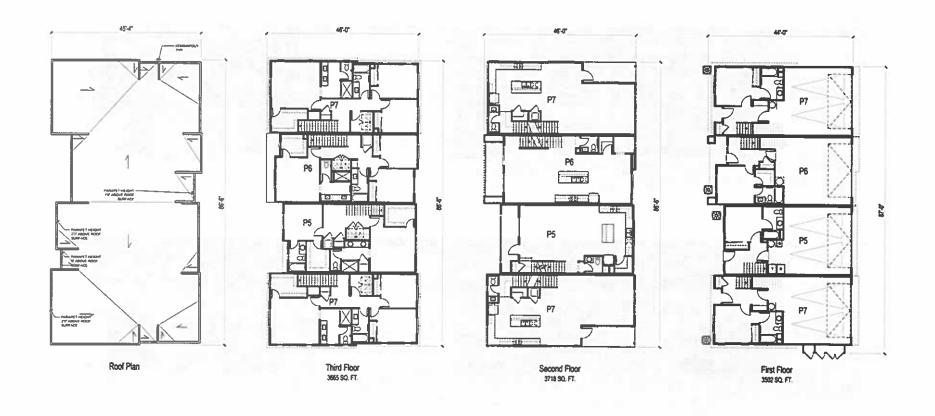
Conceptual Architecture - 4-Plex Building Floor Plan "D"
